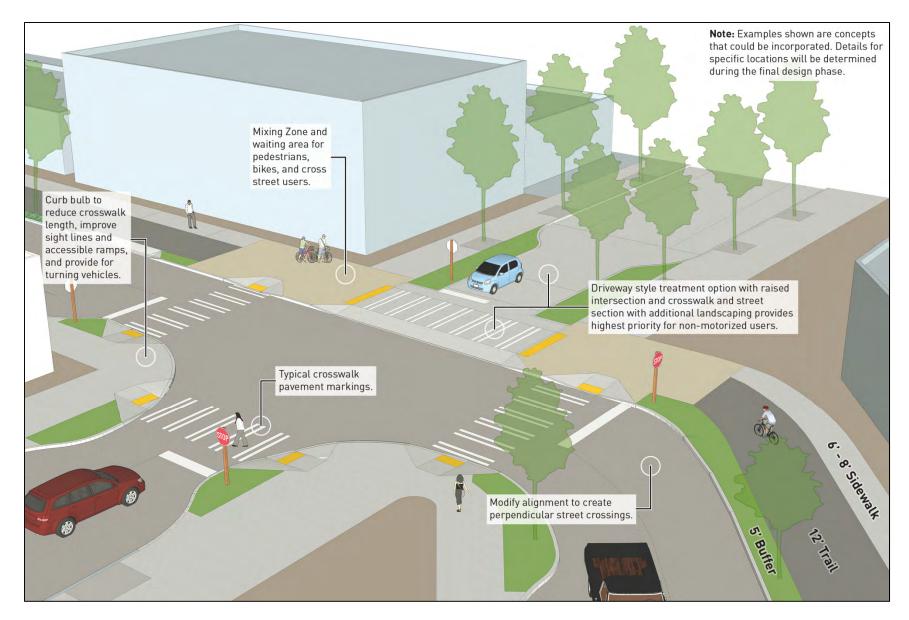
Intersection Design Options: Driveway Style Intersection
